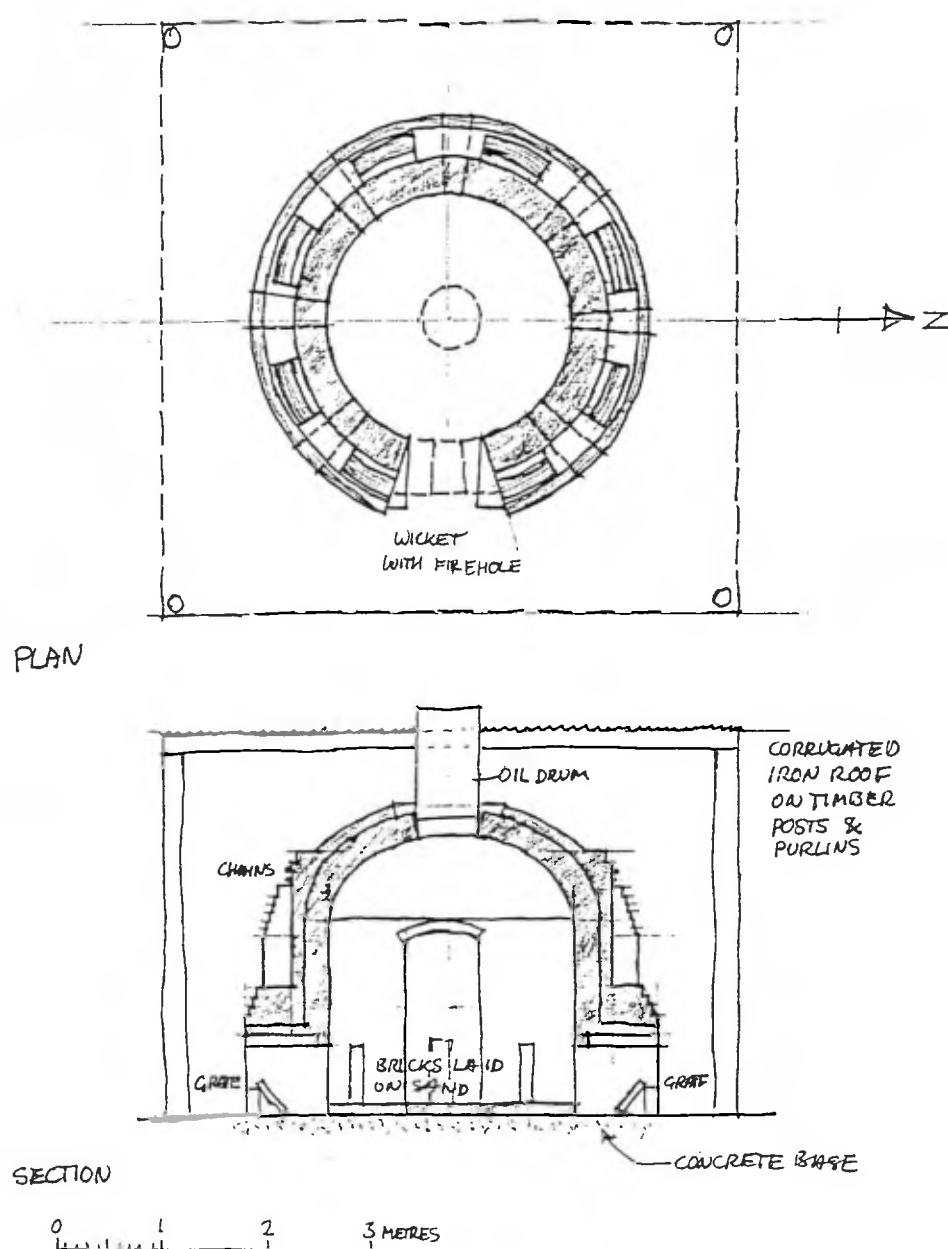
Brick kiln at Acton Scott Historic Working Farm, near Church Stretton, Shropshire, as built 1998
